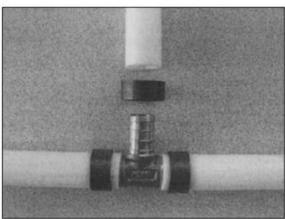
Metal Insert Fitting with Copper Crimp
